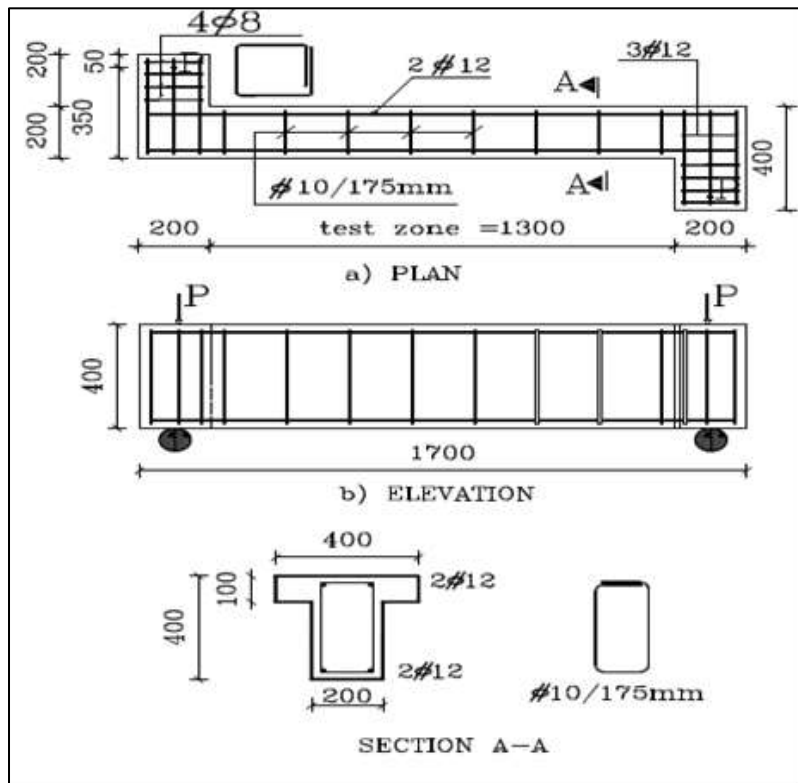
(a) Dimensions and details of reinforcement of solid beams
